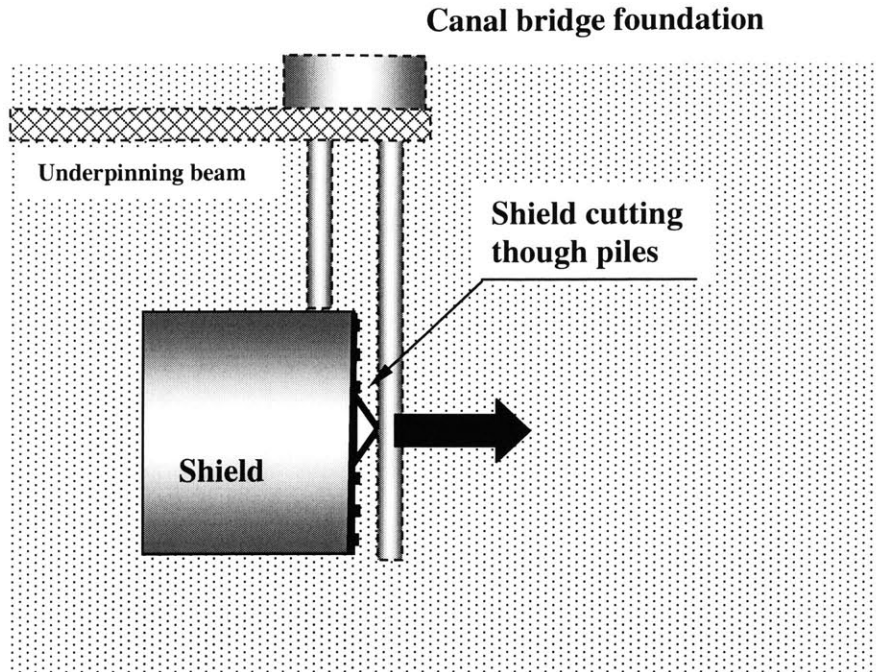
Shield cutting through piles of an underpinned canal bridge
